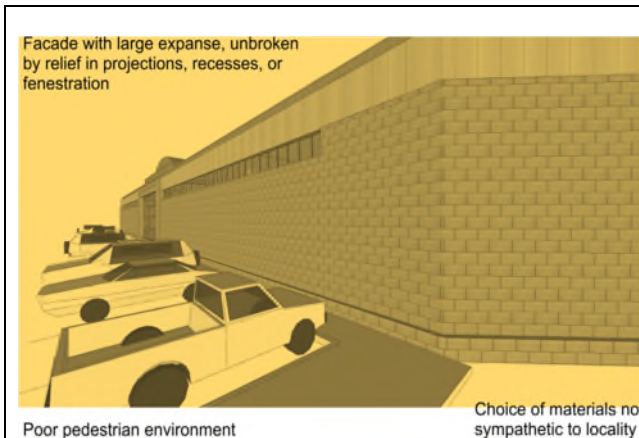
Unacceptable building form on designated commercial frontage
